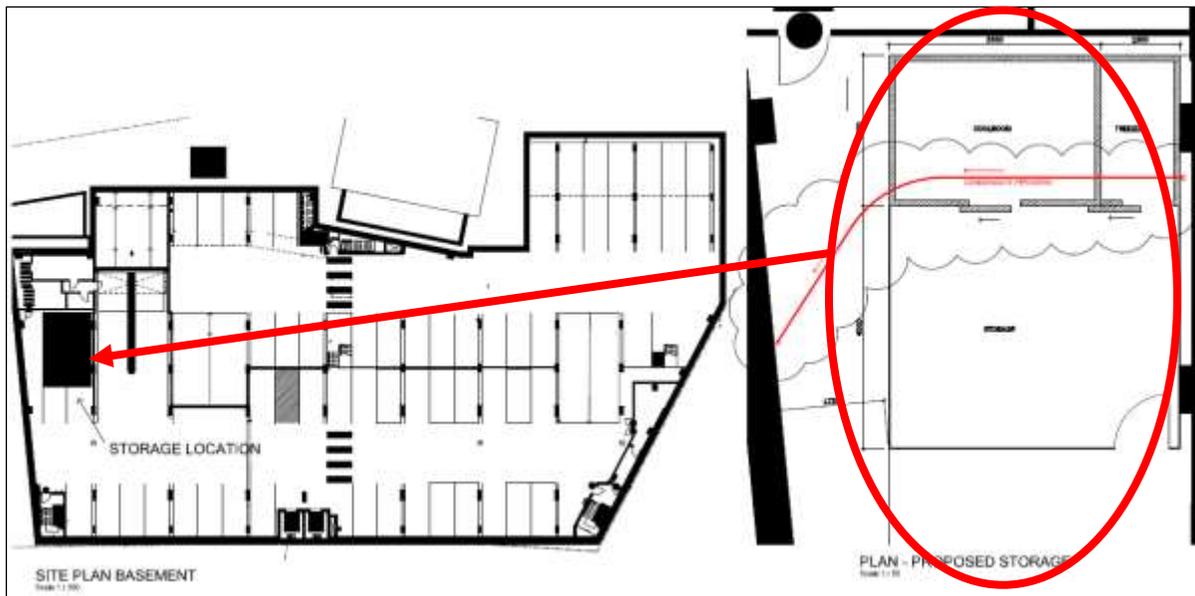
Basement Plan showing the proposed cool-room and storage (source: TS-008 Rev B prepared by Brad Ward Design).
